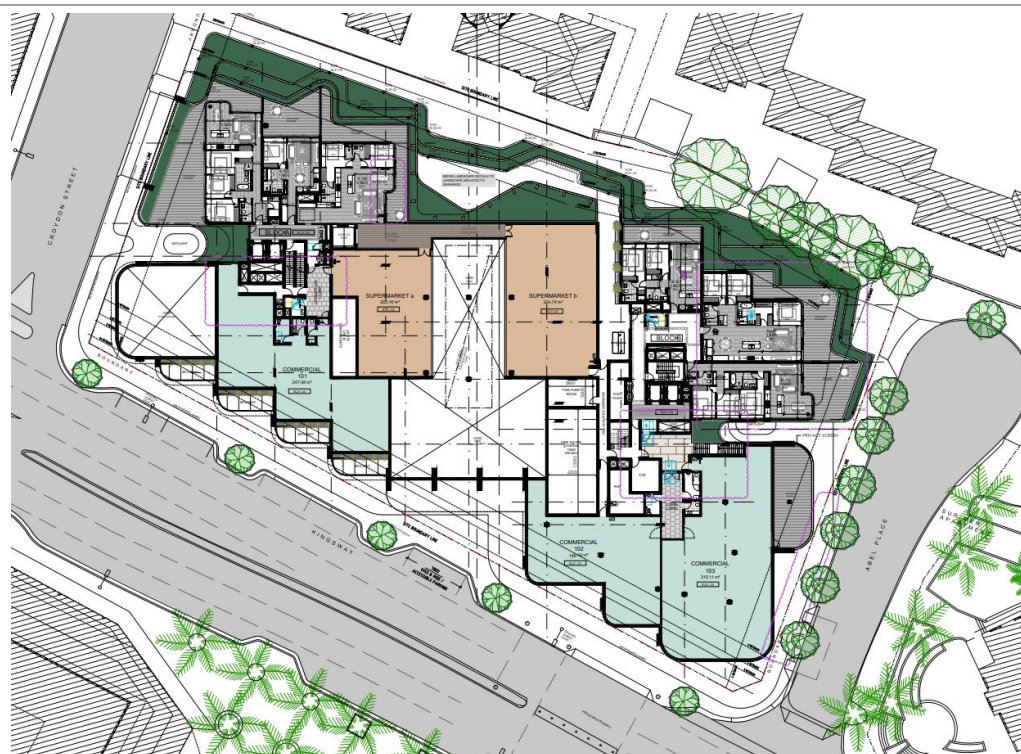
Extract of Level 1 floor plan showing the commercial/retail is kept to the front of the site with residential uses facing the rear adjoining residential zone. (Source: PBD Architects)
